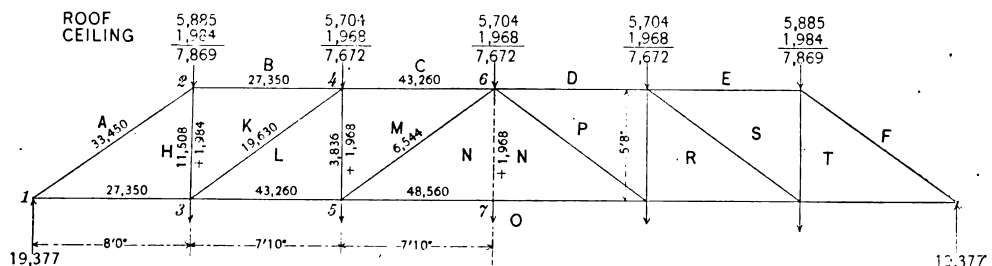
Truss Diagram with Joint Loads Indicated and Illustrating Example III.
